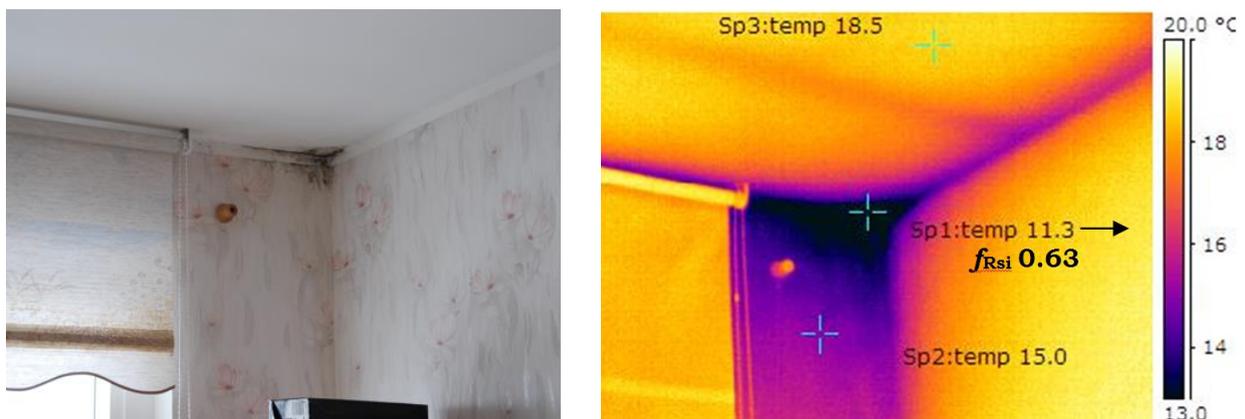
Visible mould growth at the corners of a building envelope might be caused by the thermal bridge.
